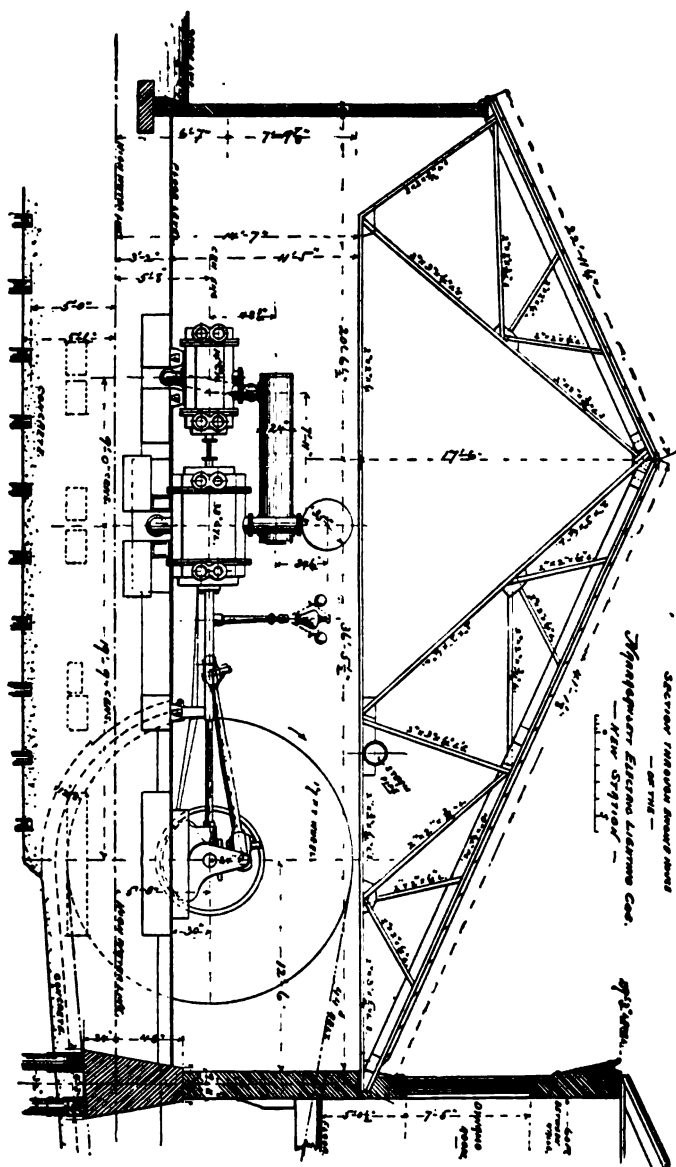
SECTION THROUGH ENGINE HOUSE.
